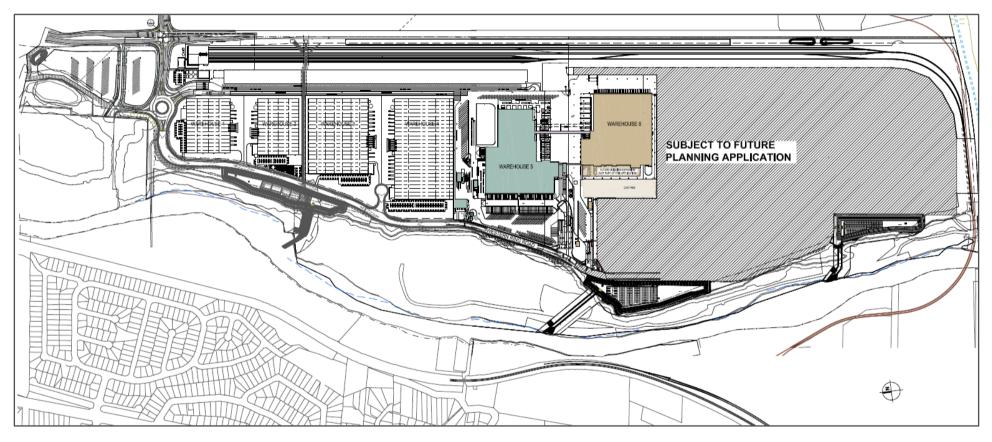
| The Proposed Site layout (Source: RTS, Appendix 1, Precinct Modificiation Plan — Proposed [sic])
